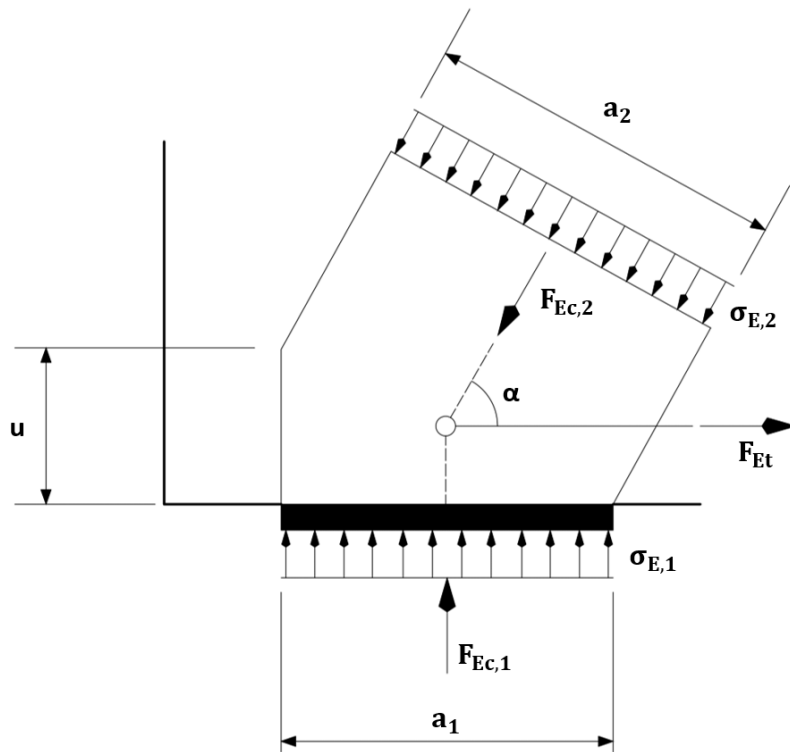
Compression tension mode with reinforcement provided in one direction. Adapted from EC2 Section 6.5 'Design with strut and tie models'.
